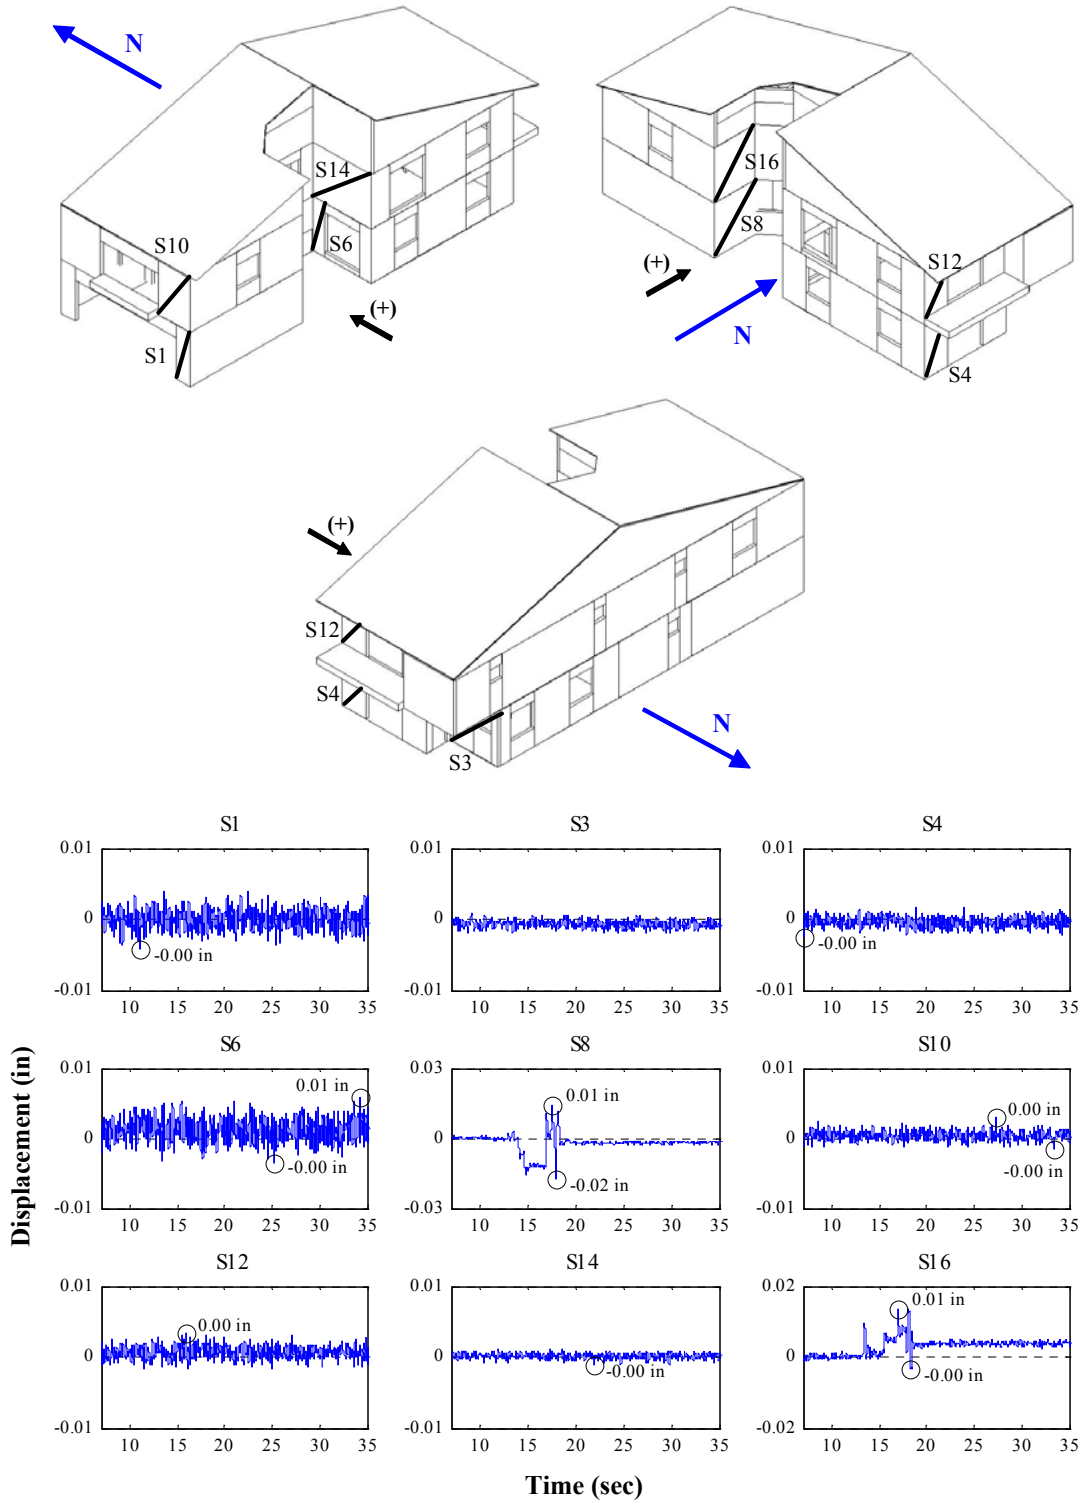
Wall deformations of north-south external walls for Test NWP2S10
